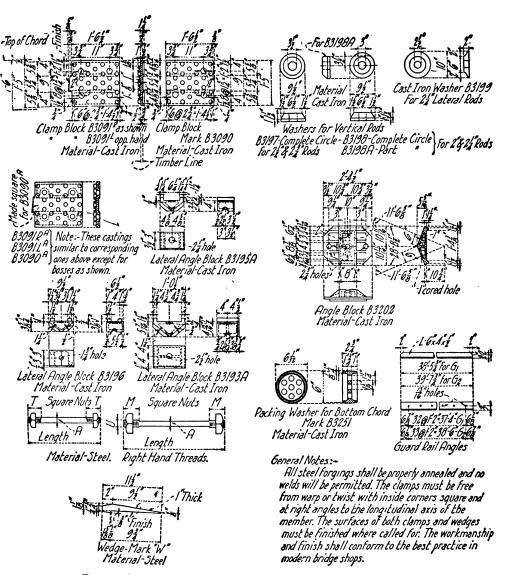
Iron Details for 150 ft. Span, Howe Truss Span. C. M. & P S Ry
